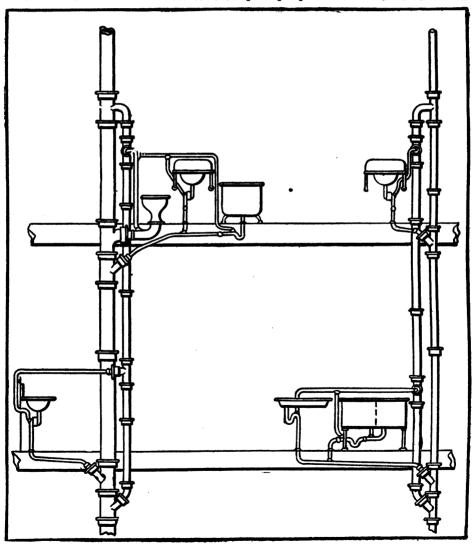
The Principal Part of Side Elevation Mentioned, Drawn Double Size.
